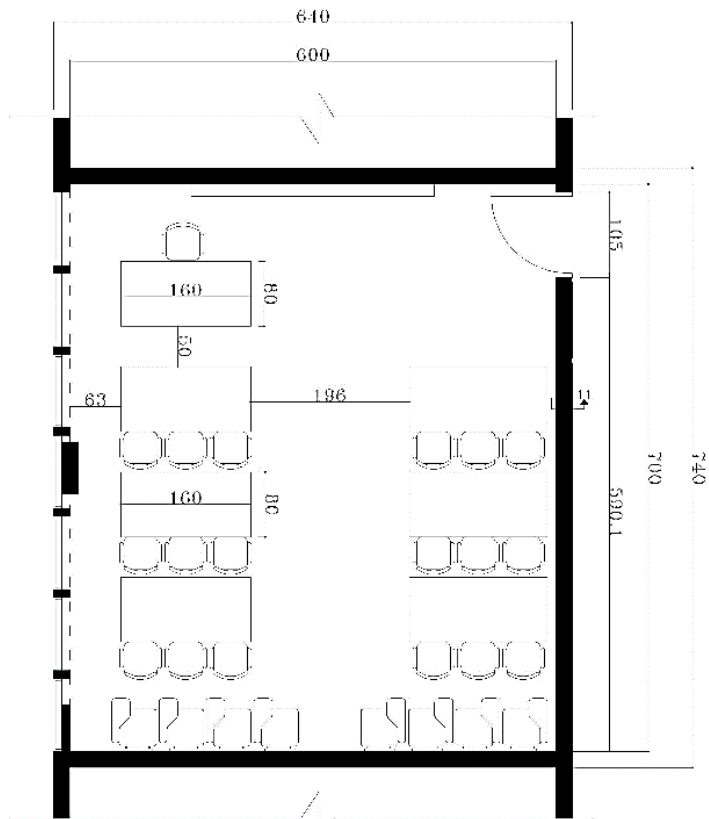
Classrooms Type-A Interior Furniture Arrangement in the Techno Park Building
